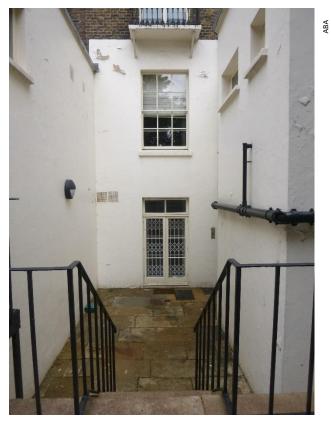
Rear elevation of No. 56; a basement window opening has been converted into a doorway
